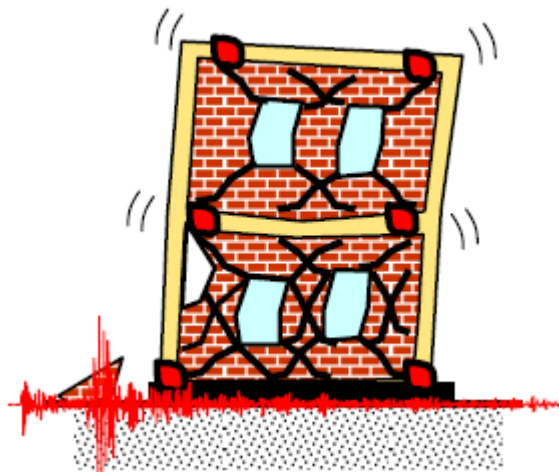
(c) Severe (Infrequent) Shaking – Structural damage, but NO collapse
